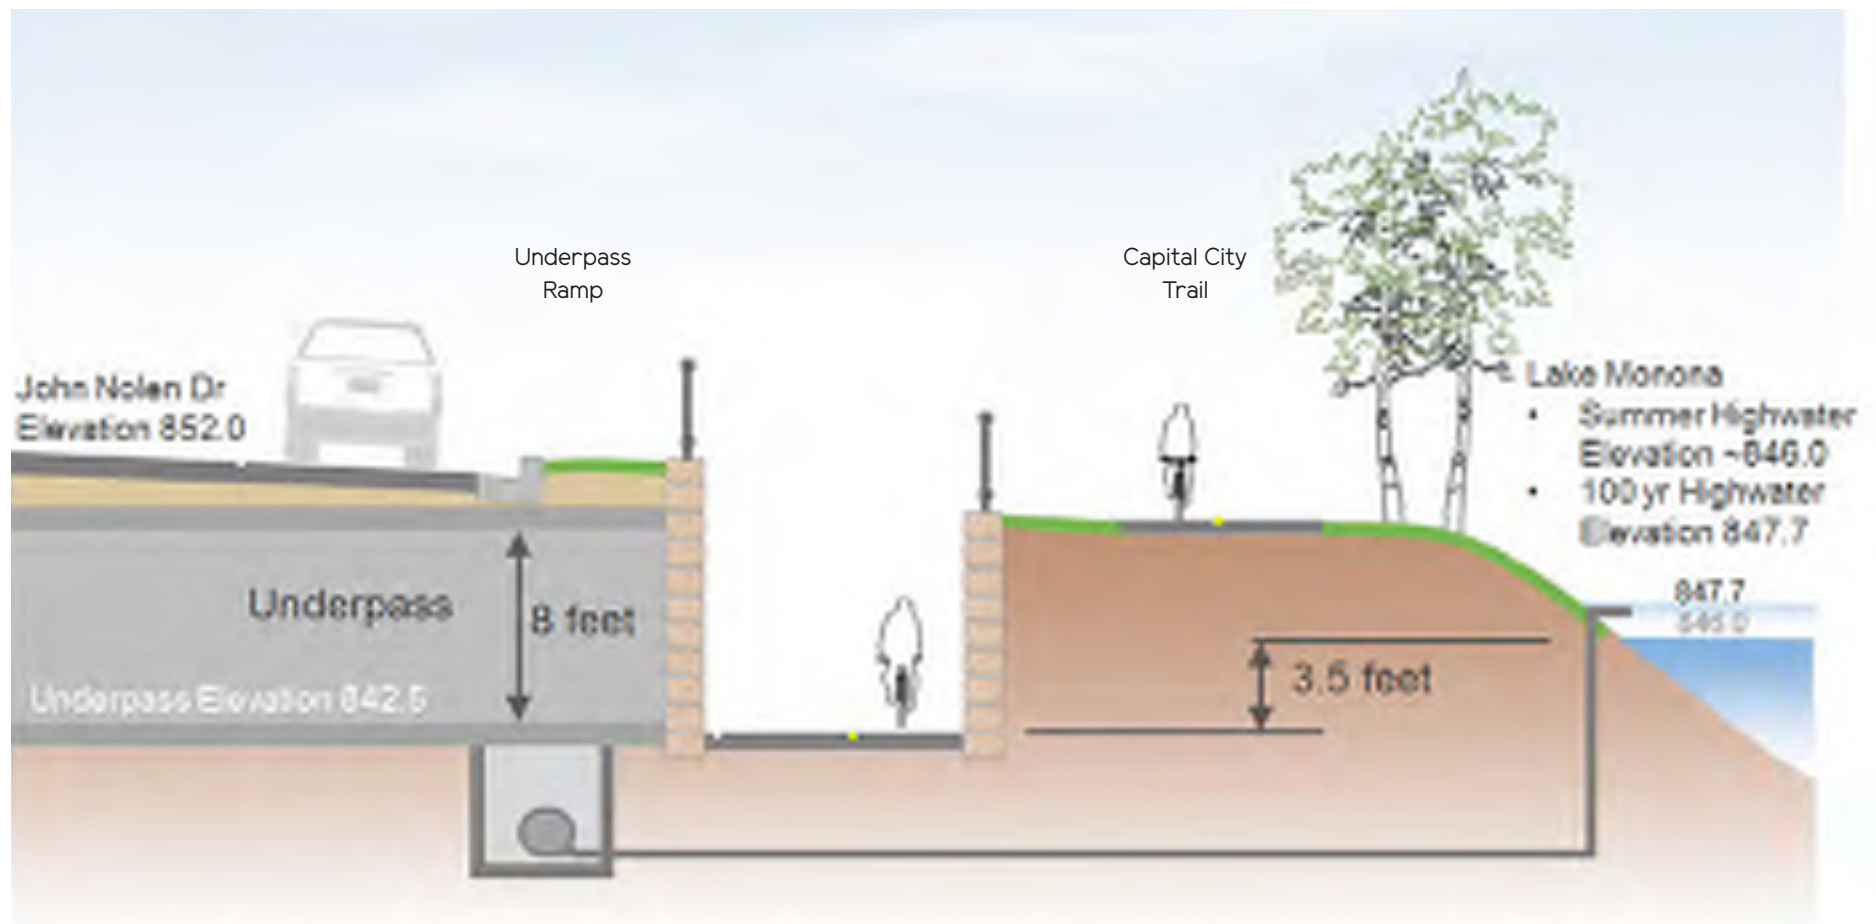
North Shore Drive-Long Term Solution - Underpass Cross Section (Blair Street Corridor Study Report)
